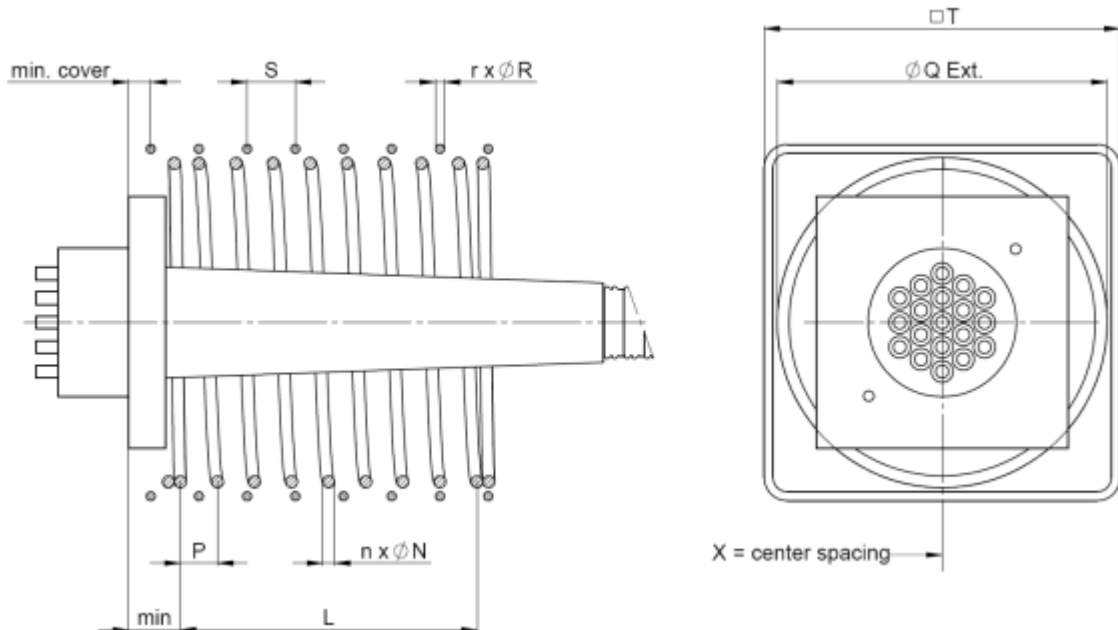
Local anchorage zone reinforcement type E @ 43/53 MPa
